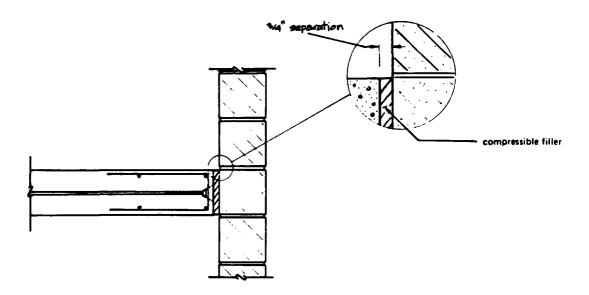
Post-Tensioned Connections (Ref. 13).
